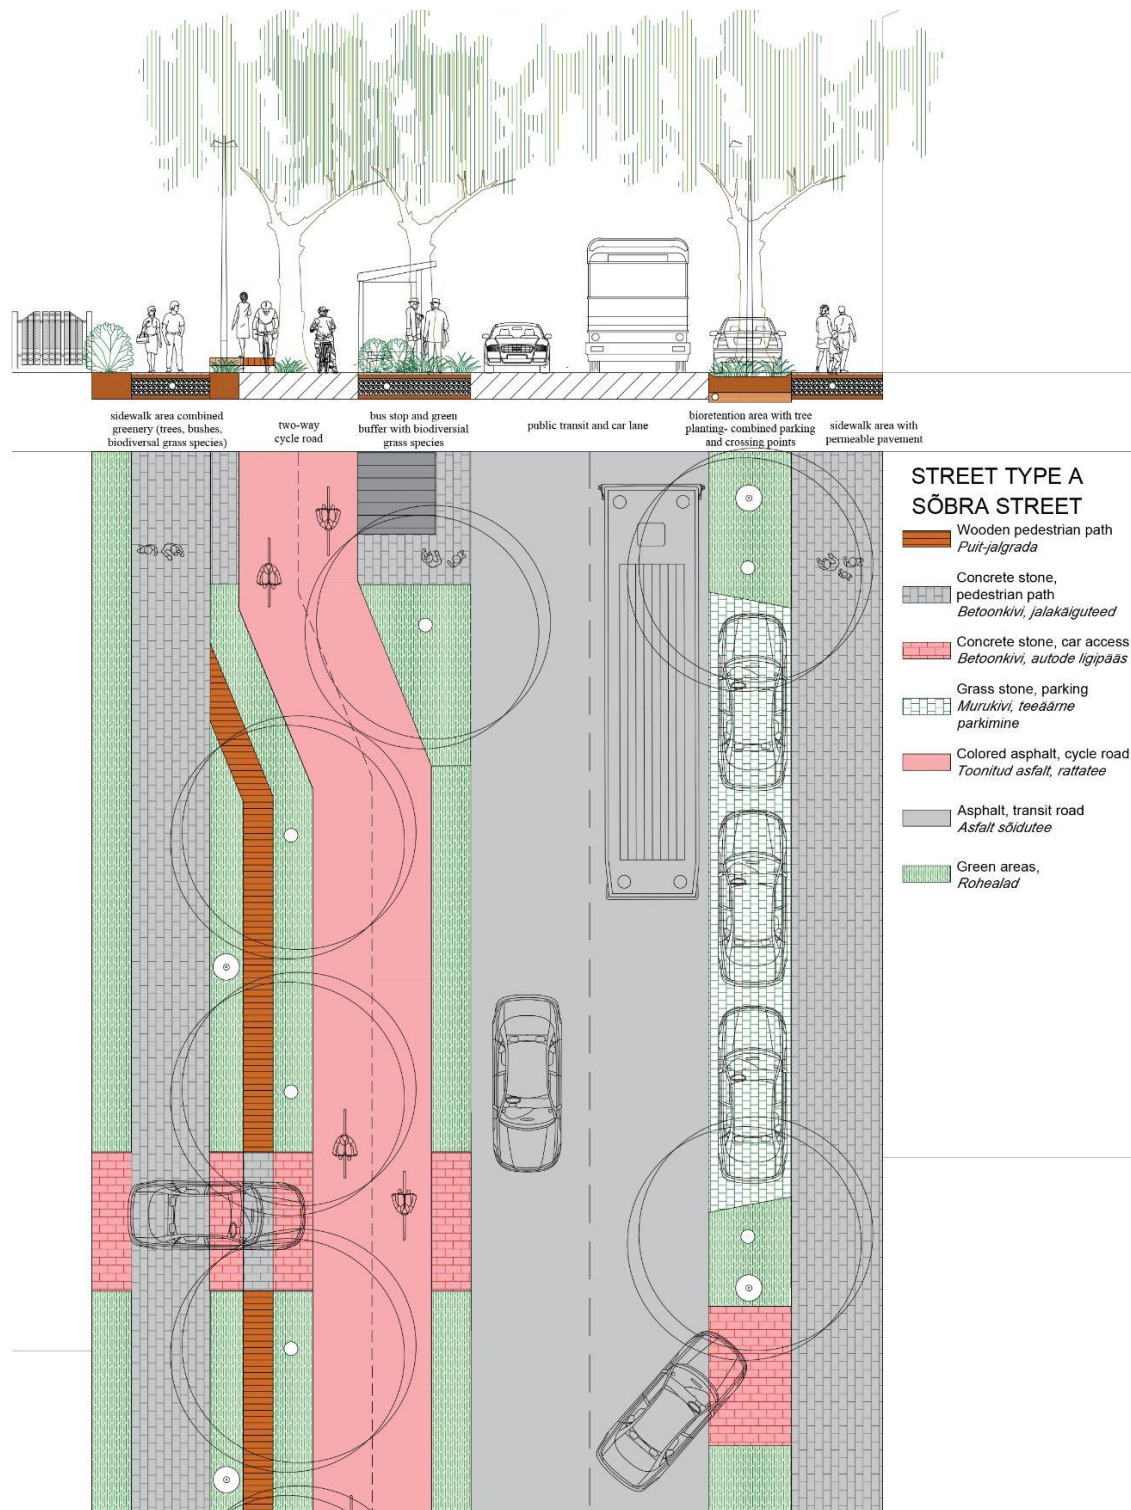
Conceptual section and plan segment of street type A (Author, 2021).
